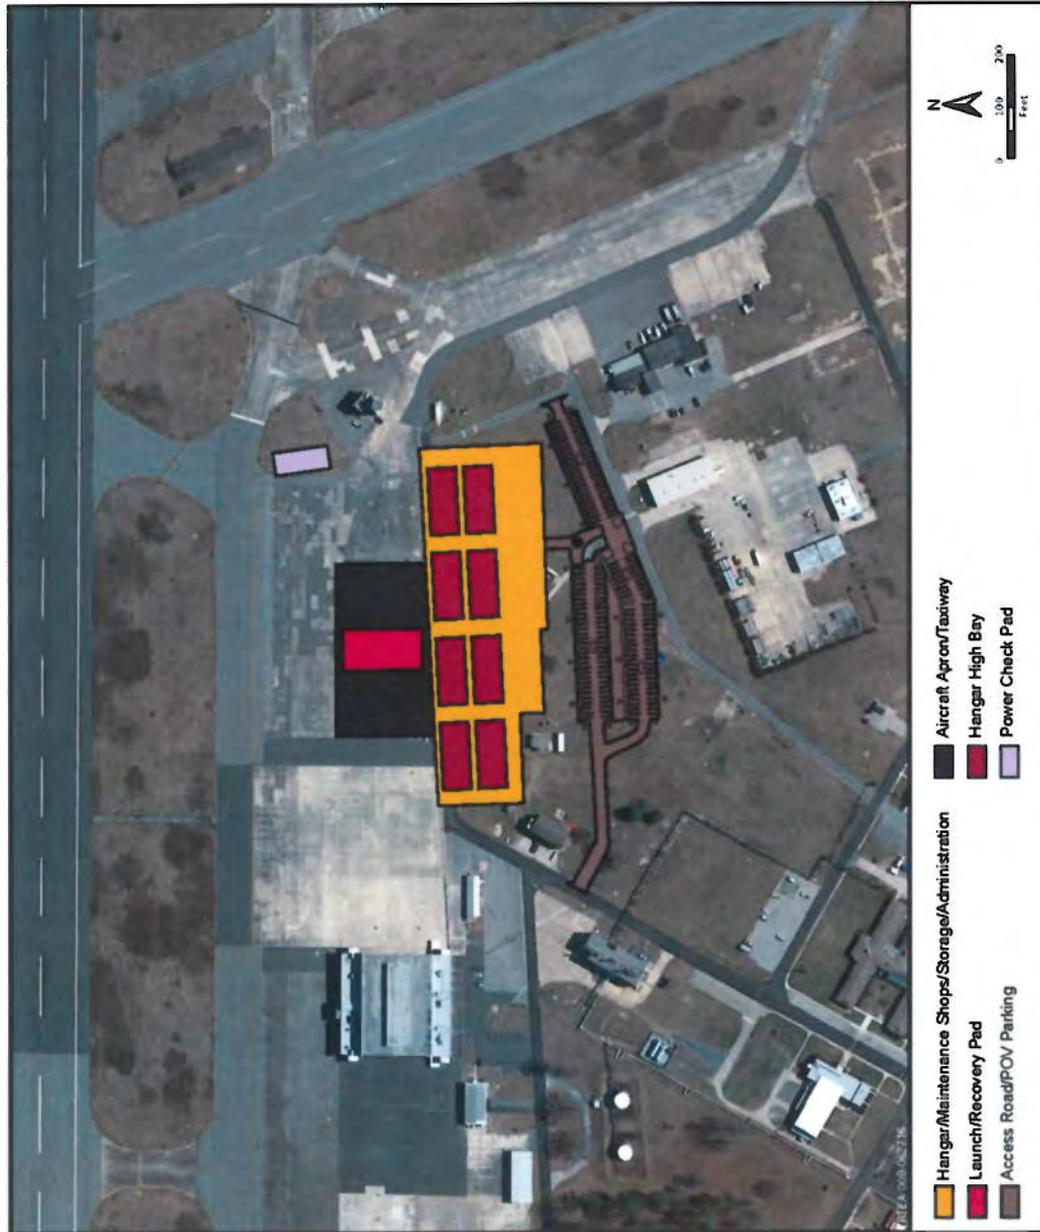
Alternative 3, Wallops Flight Facility – Proposed Project Area Construction Features
